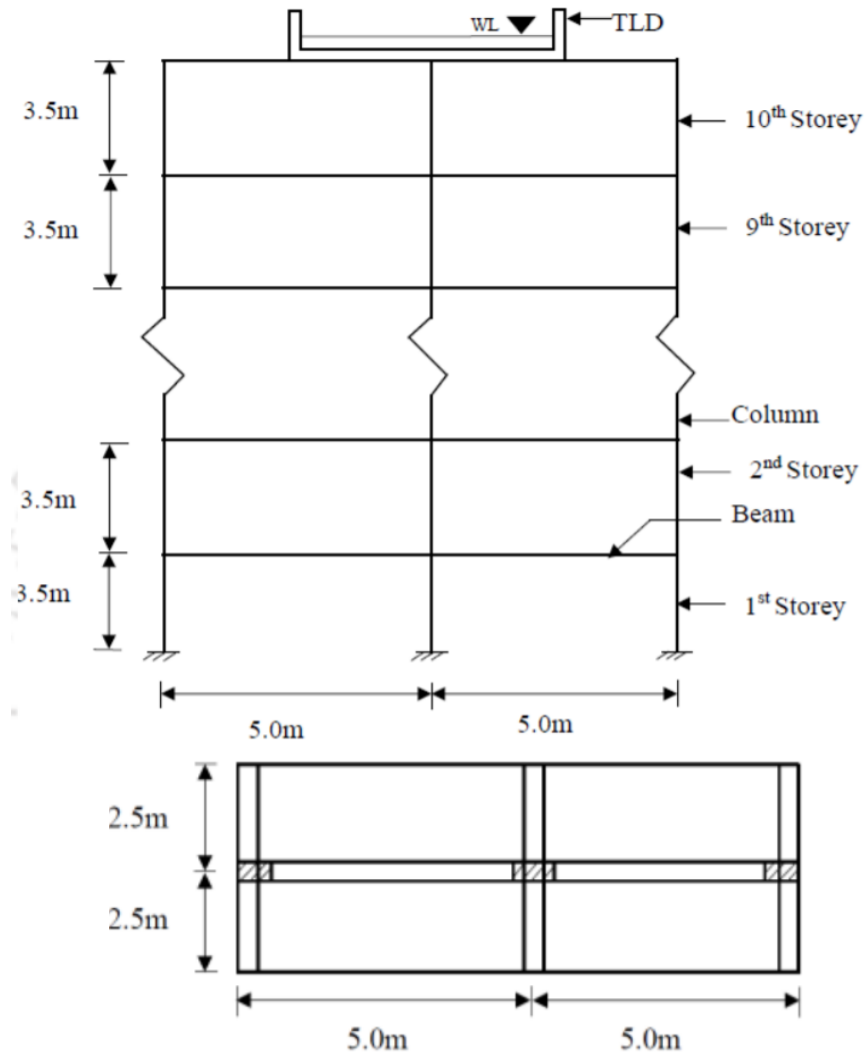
Structural model of a 2D representative frame (a) Elevation, (b) Plan
